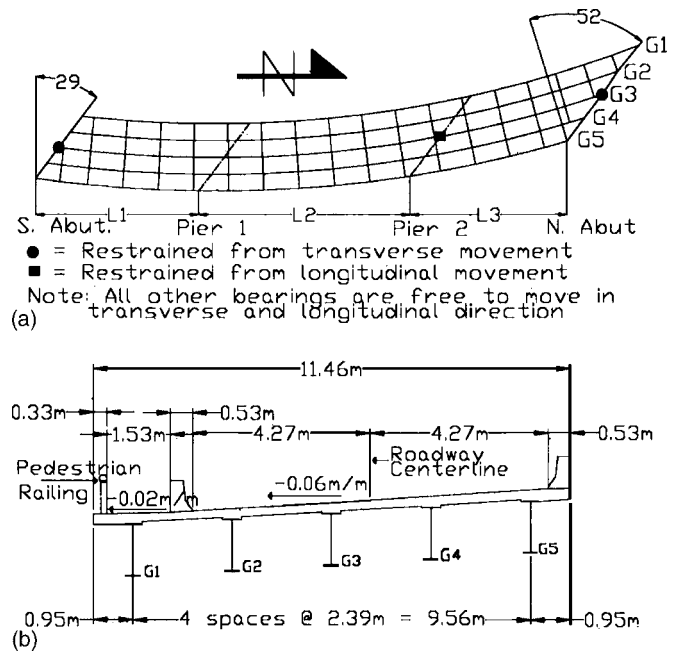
Tested bridge: (a) Plan view and (b) cross section looking North
